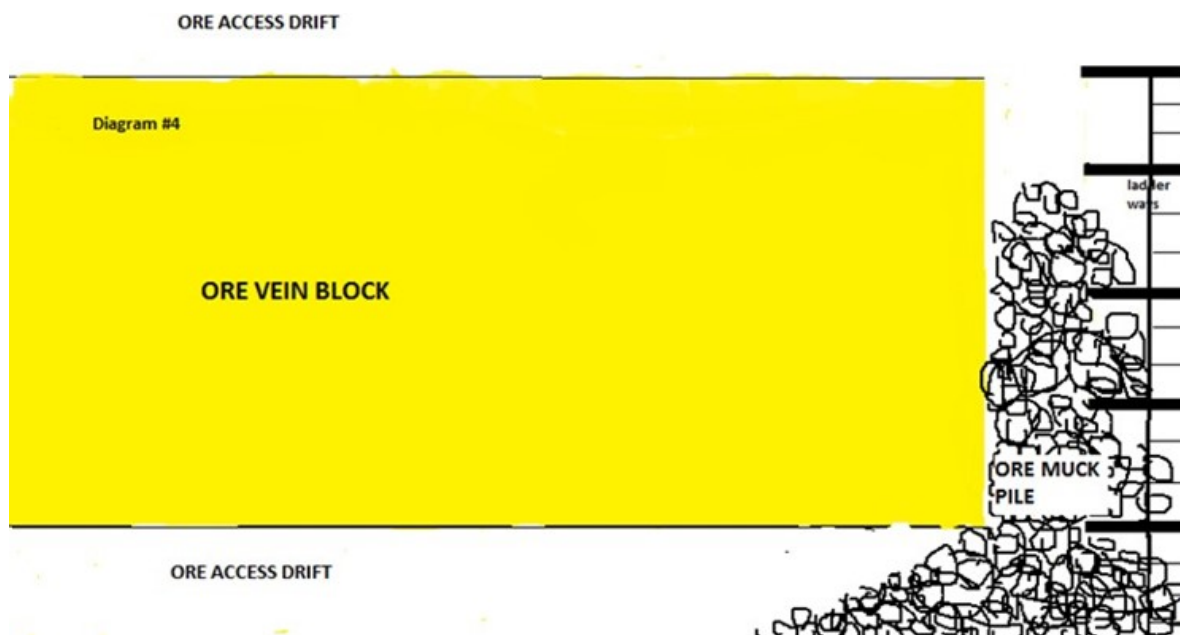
Schematic shows a vein in cross section to be drilled
